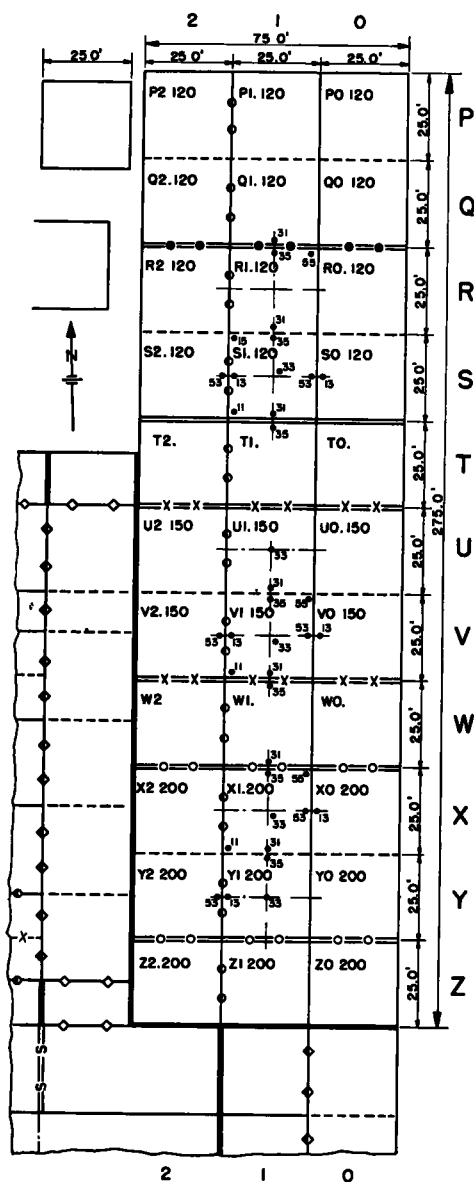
Layout and details of deflection-gage installation, Lockbourne No. 2 Modification.
